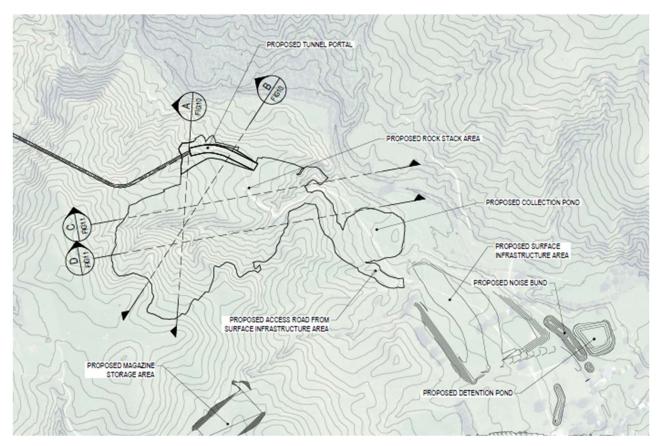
Willows Rock Stack Collection Pond Location (EGL, 2025a)
